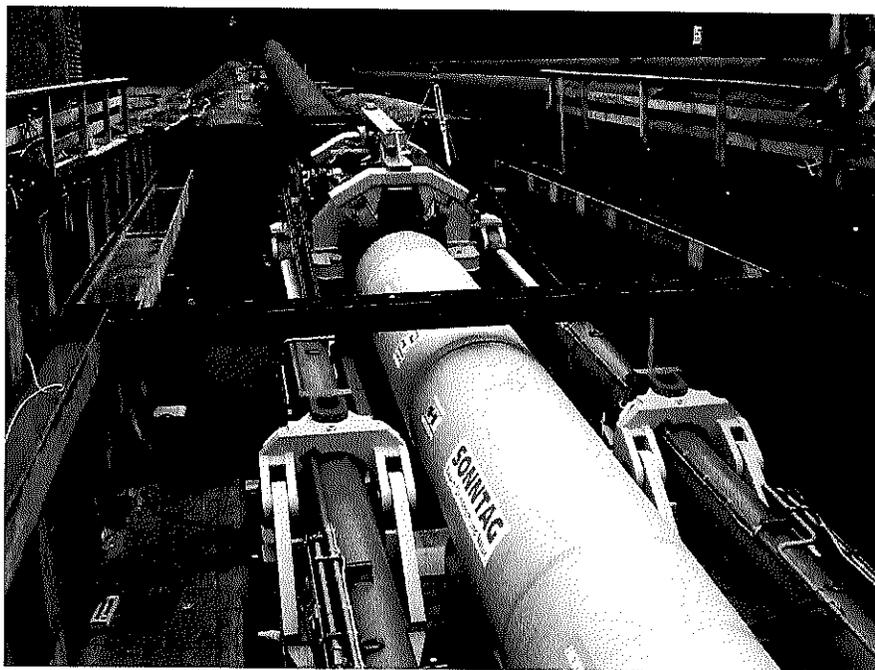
View into the launch pit during machine launch: In the front, the Herrenknecht Microtunnelling Machine AVN1000XC and the Pipe Thruster; in the rear, the first pipe section on pulley blocks.
